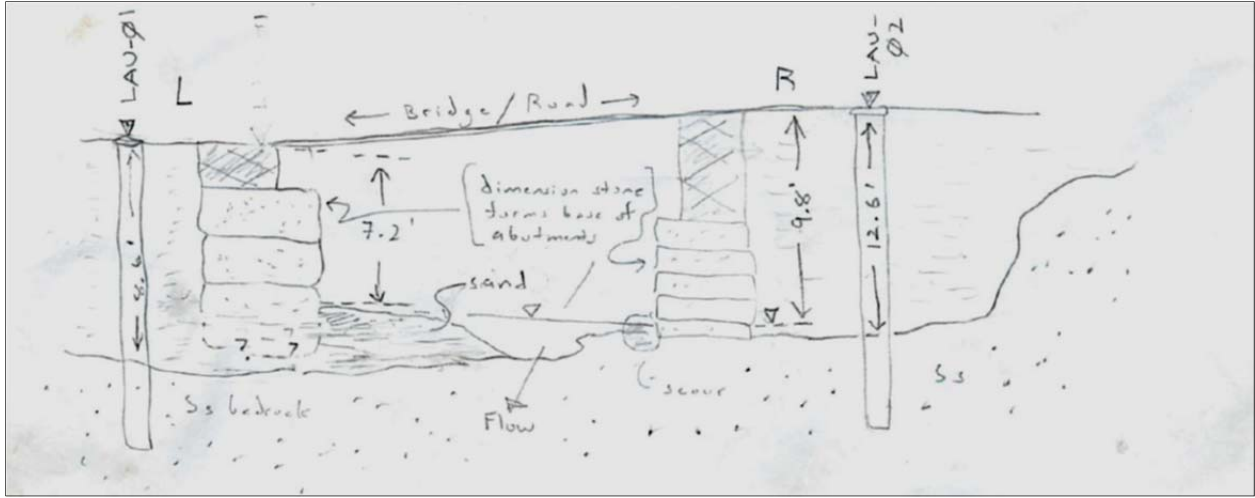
Field sketch of Laurel Fork Bridge, looking upstream.
